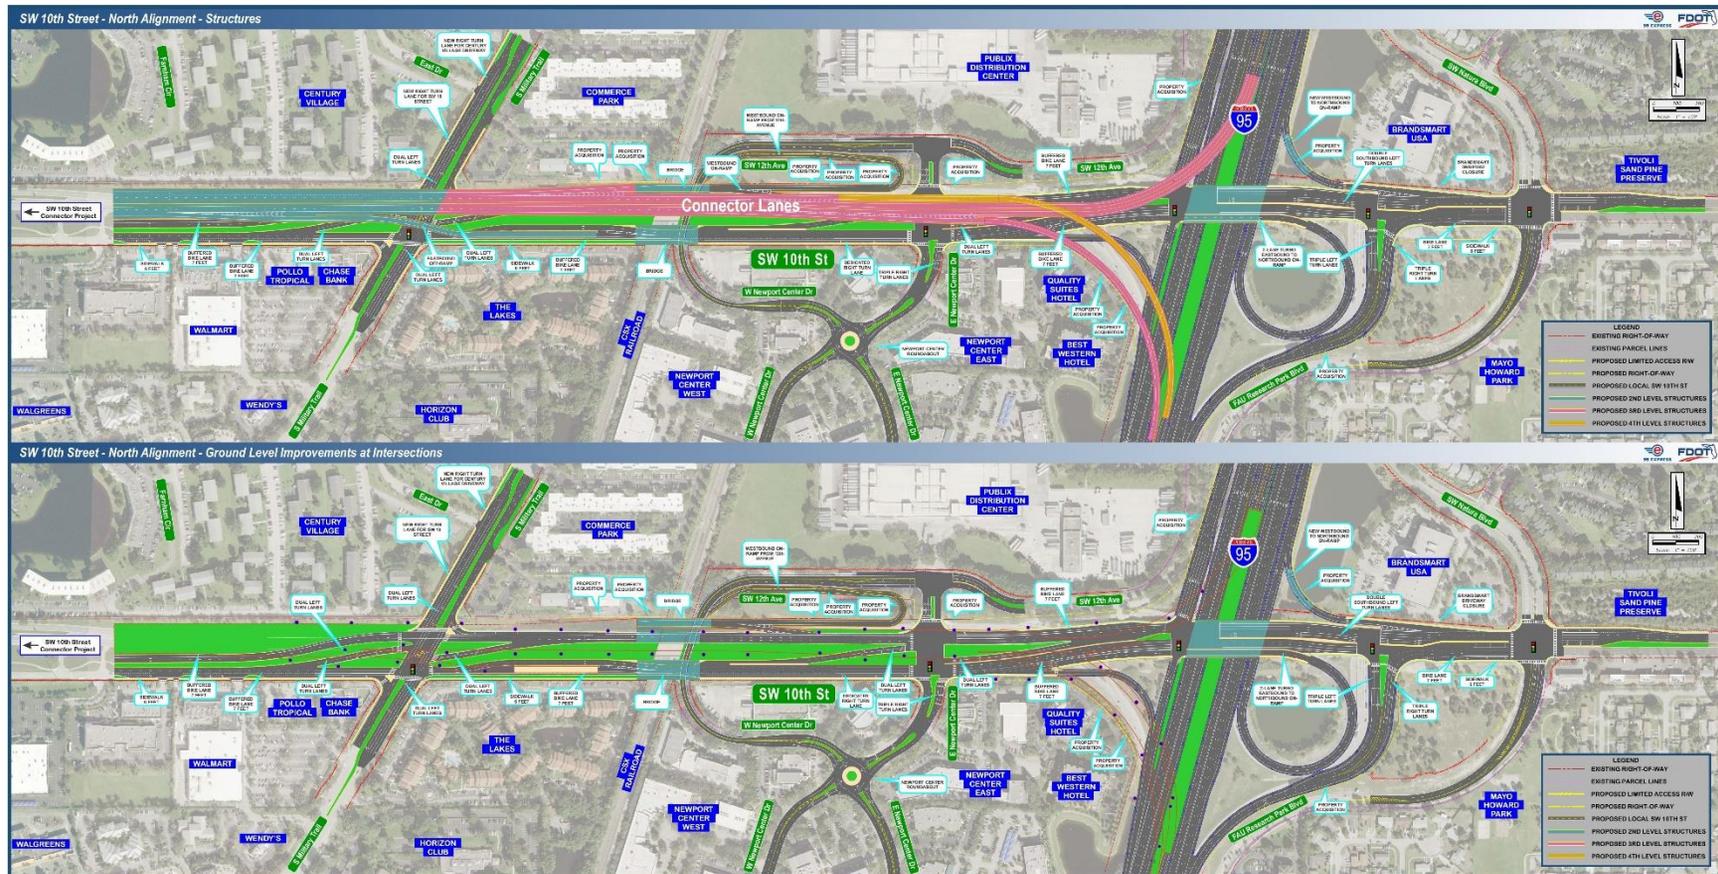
SW 10 Street – North Alignment Concept Plan
